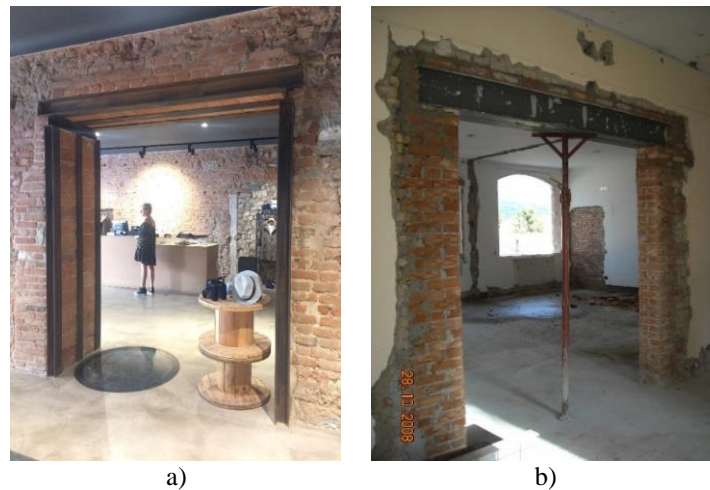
a) Example of a new opening in a store in the historical center of Brescia, Italy; b) new opening in the ground floor of a dwelling house.
